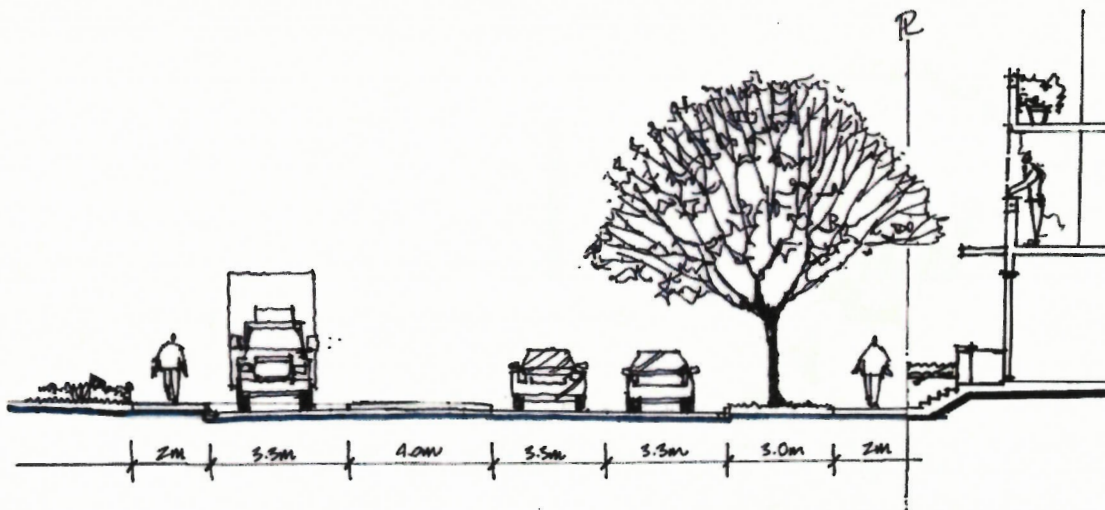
Illustrative Section across Esquimalt Road (Illustrating minimum streetscape widths)
